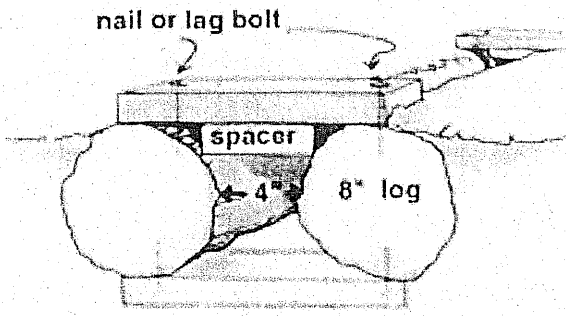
Proper Construction of Pole Culverts on Logging Roads.
